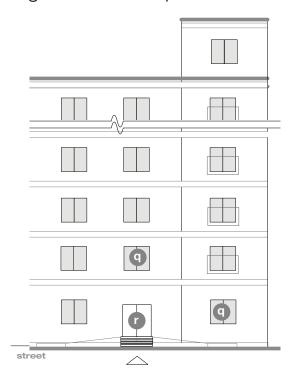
(3): Transparency and Building Entrance Requirements.
